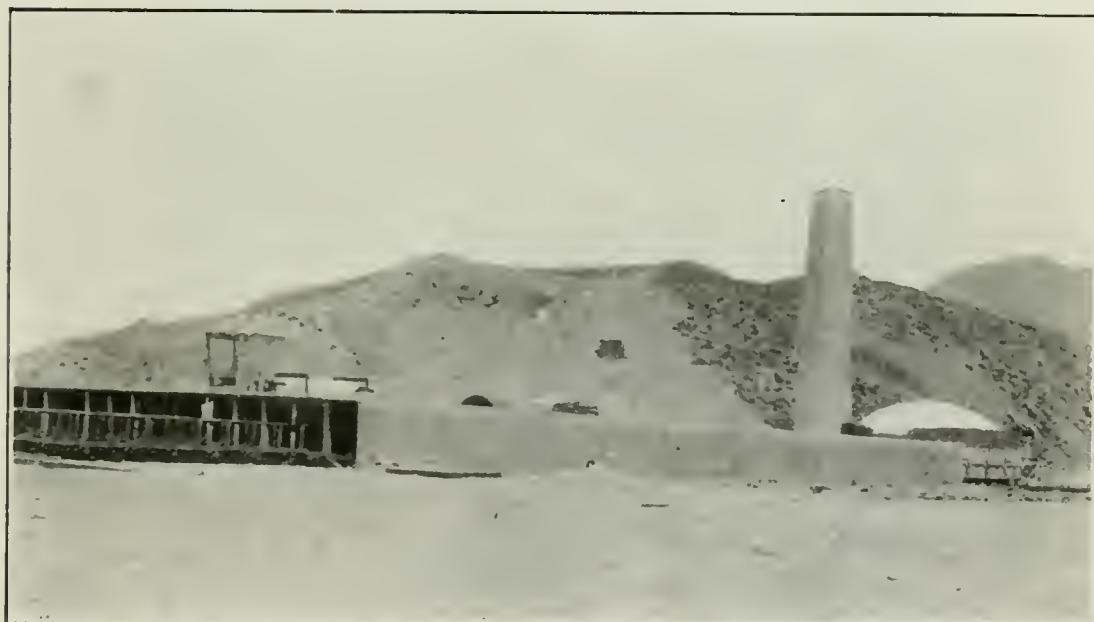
Los Angeles Brick Company, Alberhill plant, tunnel driers, during construction. Riverside County.
